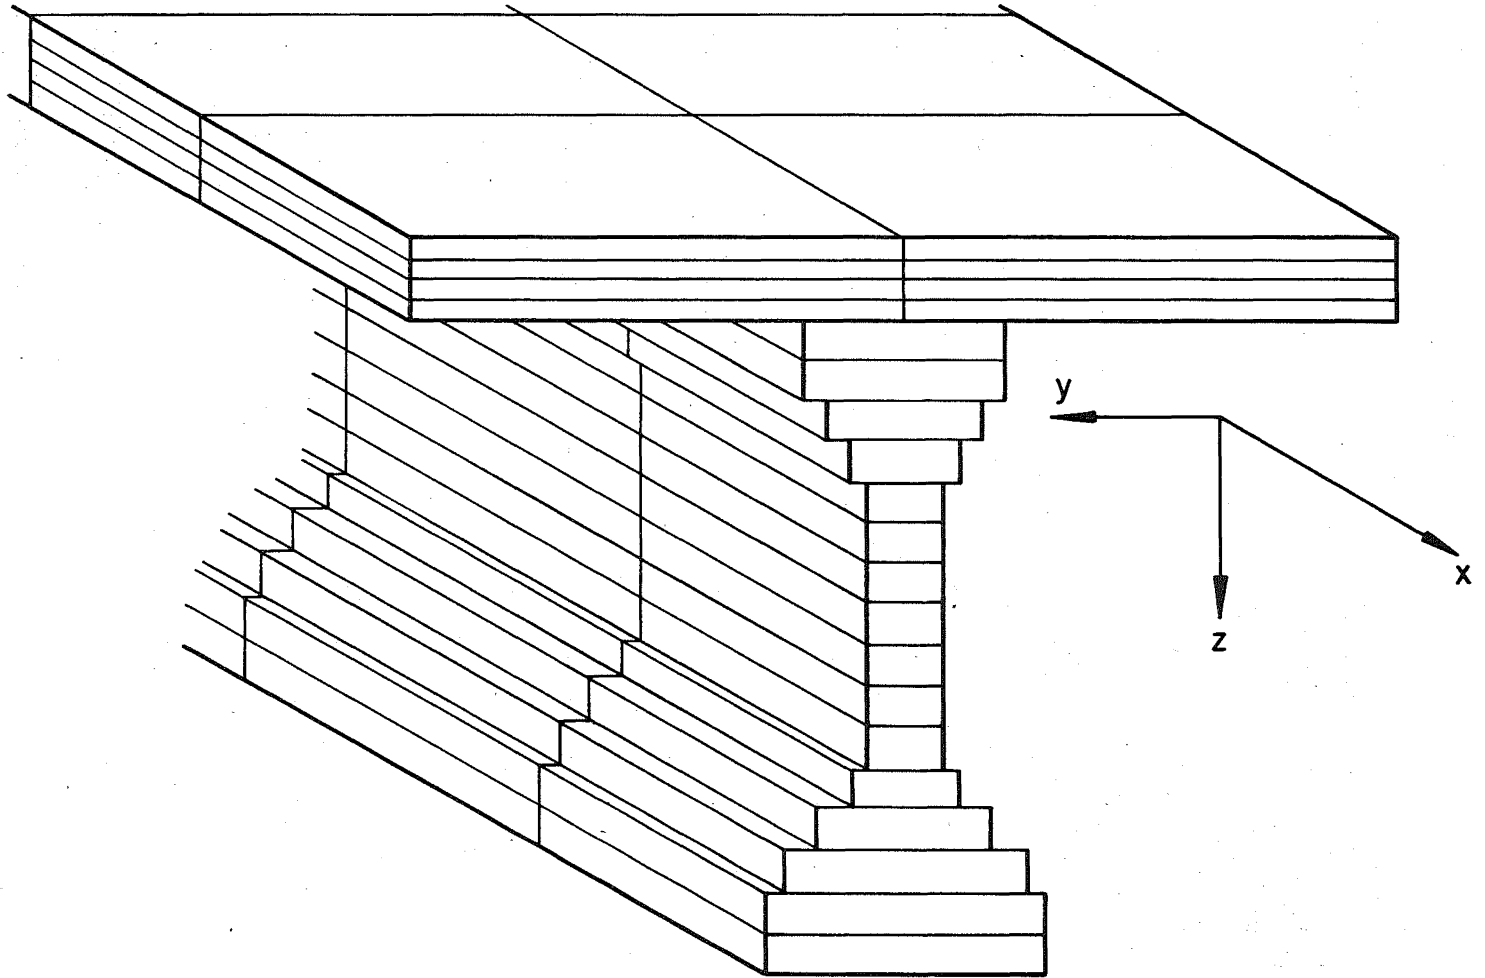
Layered Elements Used to Idealize a Beam and Slab
